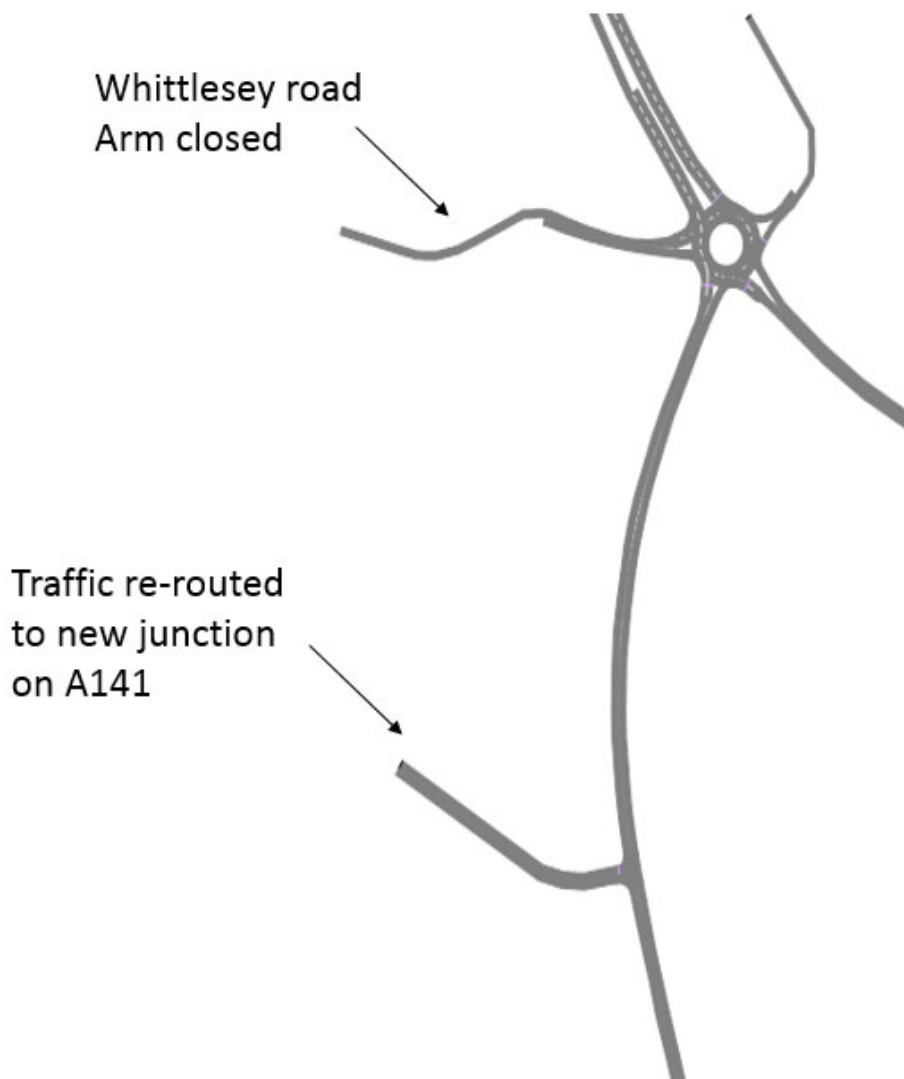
Peas Hill Roundabout Option 5.3 Design Layout
